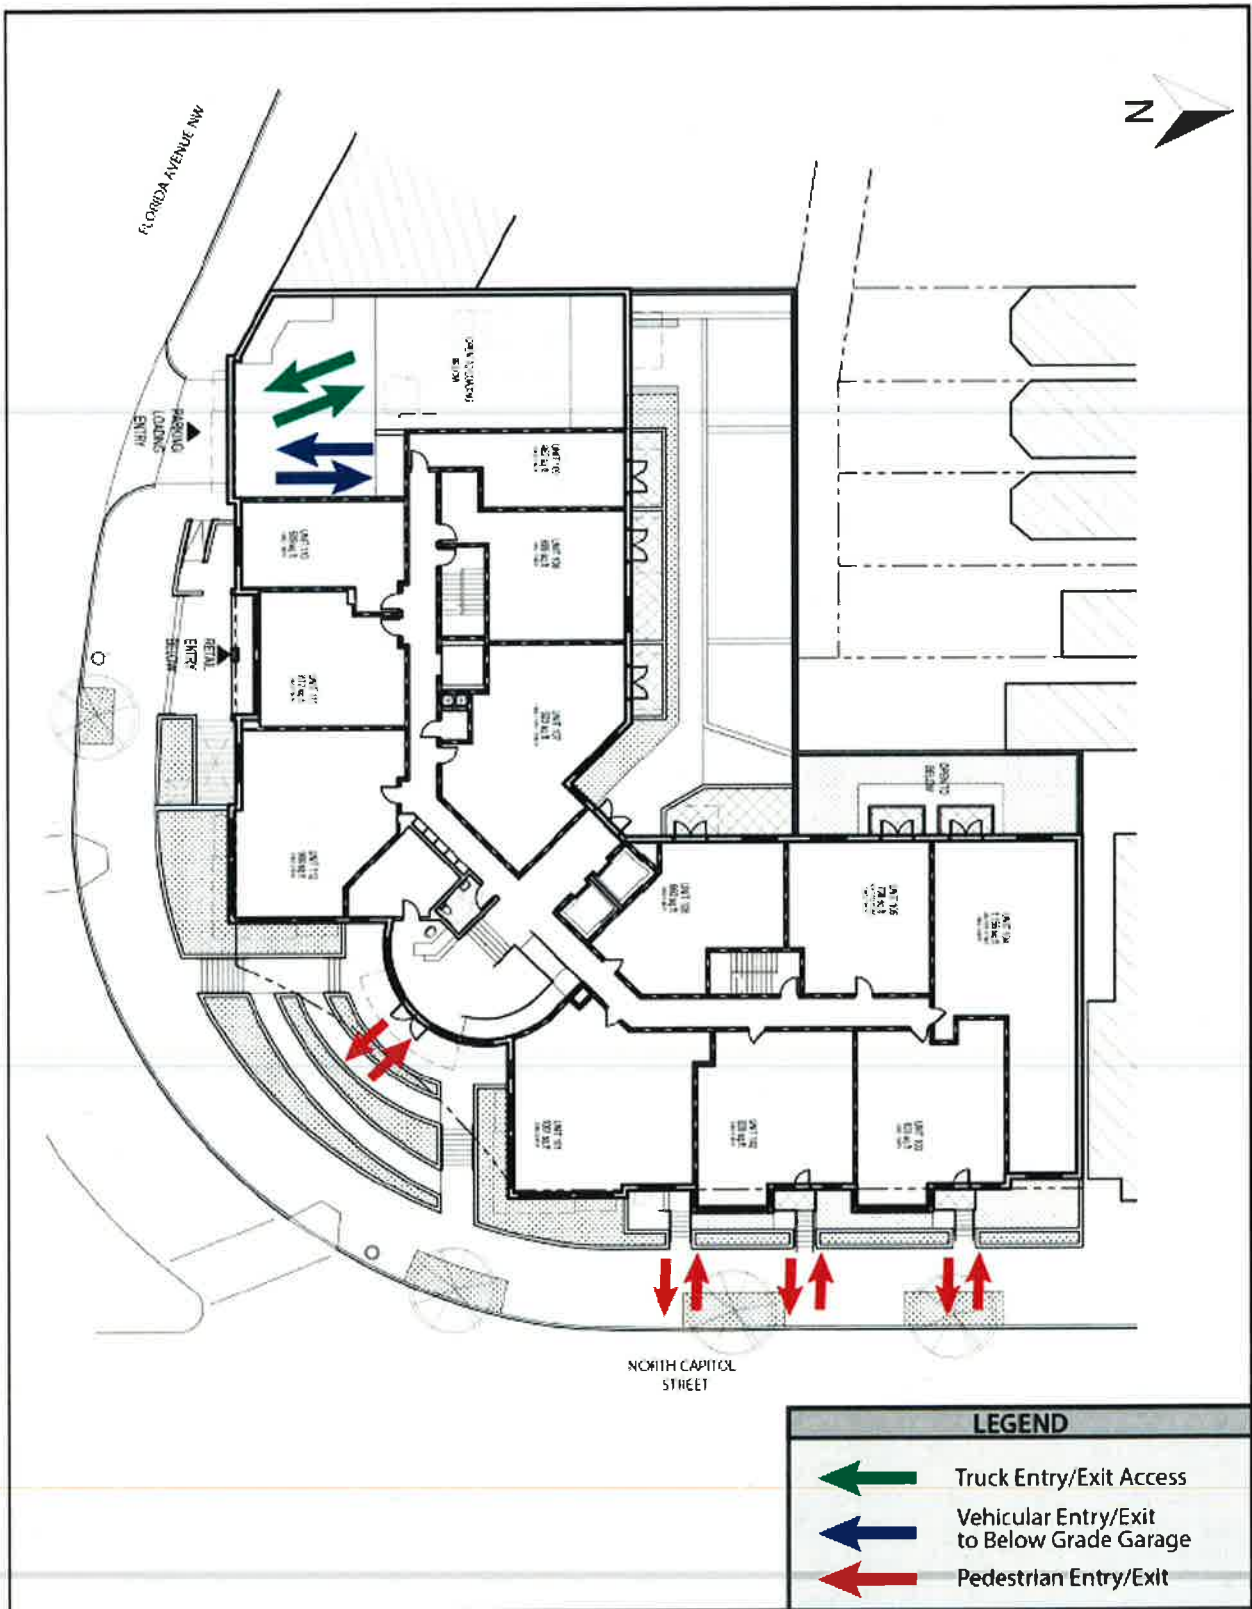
Proposed Site Layout and Access. Source: Applicant's Transportation Memorandum. 8/9/13. Symmetra Design.
